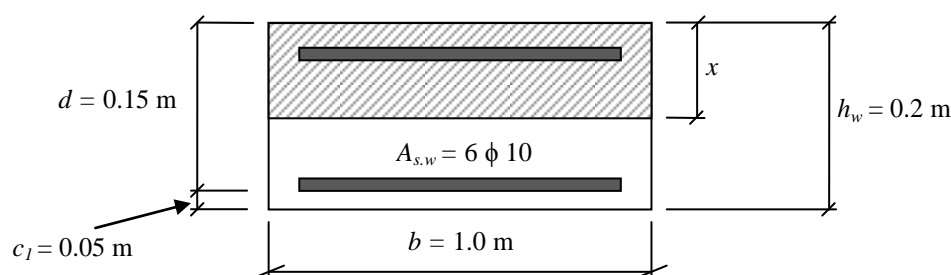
Model illustrating the cross section of a wall panel with a width of 1 m.
